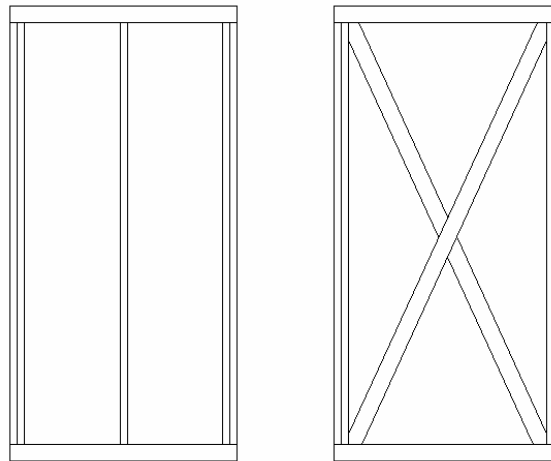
Basic framing layout for conventional Type 1 shearwalls (left) and braced Types 2, 3, and 4 shearwalls (right).
